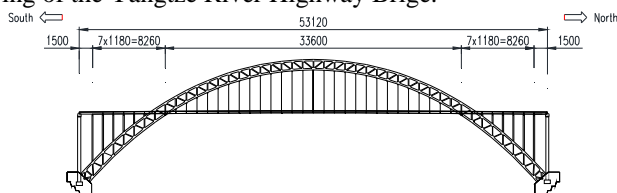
The general arrangement drawing of the Yangtze River Highway Bridge(cm)
